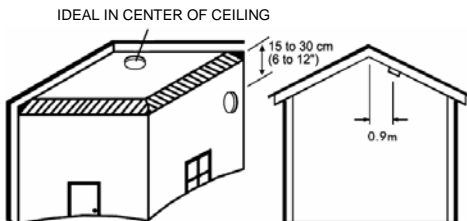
Smoke Alarm Positioning on Ceilings or Walls (left) & on Sloping Ceilings (right)
